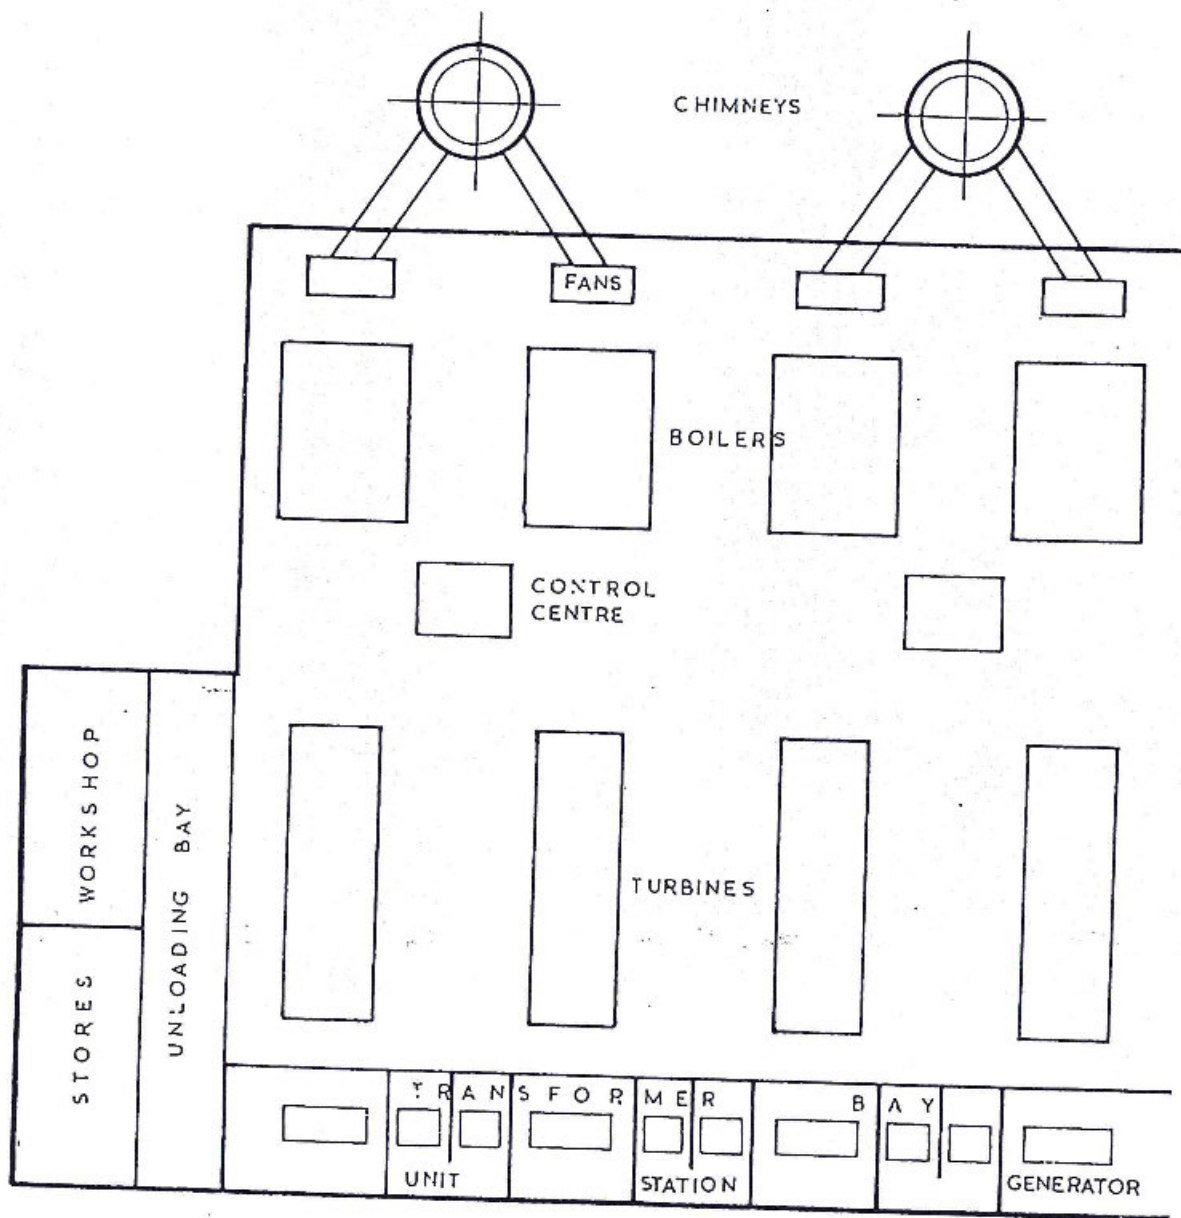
TYPICAL 4-UNIT STATION LAYOUT
